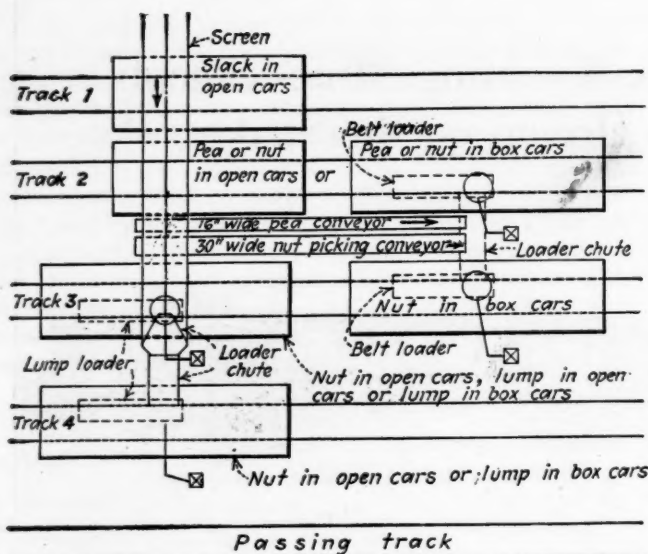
SCHEMATIC PLAN OF TIPPLE PLANT
